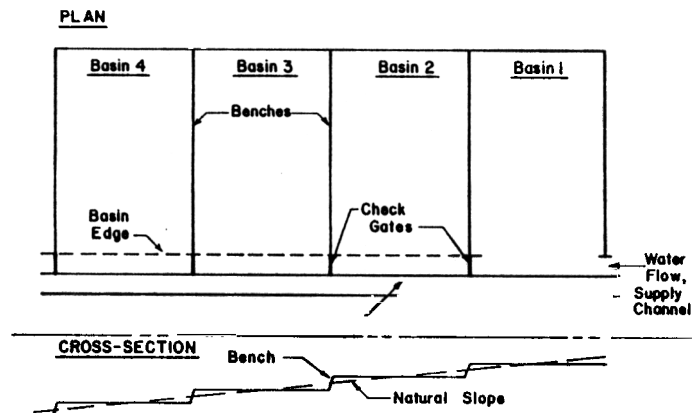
Field layout (plan view) of surface-draining level-basins and cross-sectional view of benched system.
